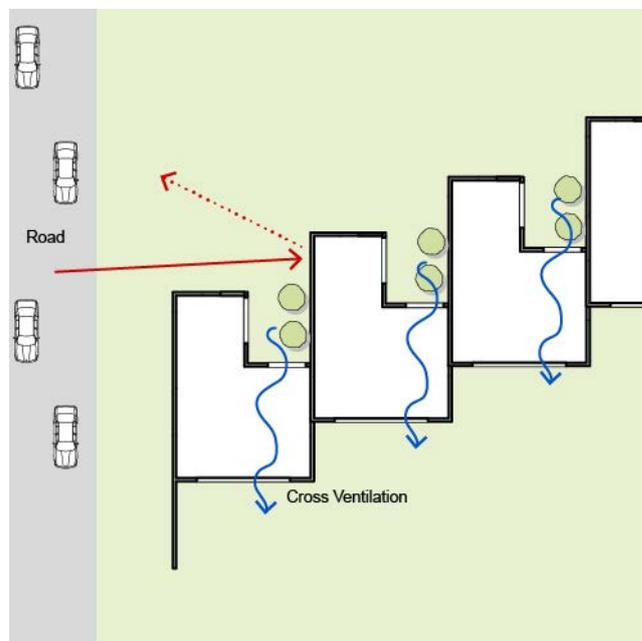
Staggered terrace houses can be arranged to shield windows from excessive traffic noise and still allow for cross ventilation
